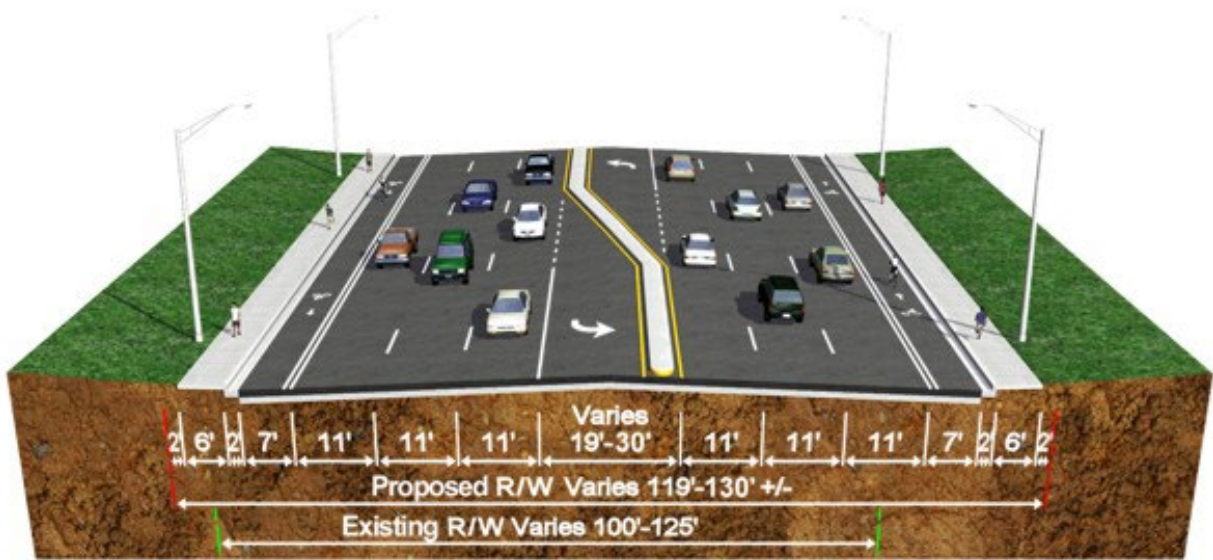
| Proposed US 41 Roadway Typical Section - Palm Avenue to Gibsonton Drive
